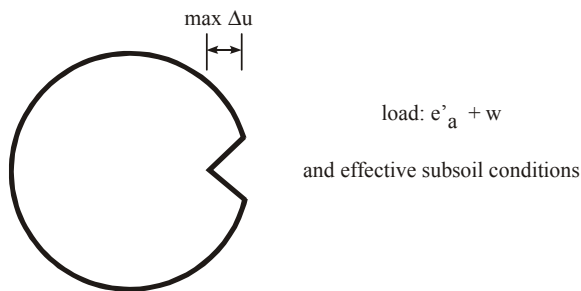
Circular excavation with tolerance of adjacent panels of a diaphragm wall or adjacent bored piles under earth and groundwater pressure (2nd order geometric imperfection)
